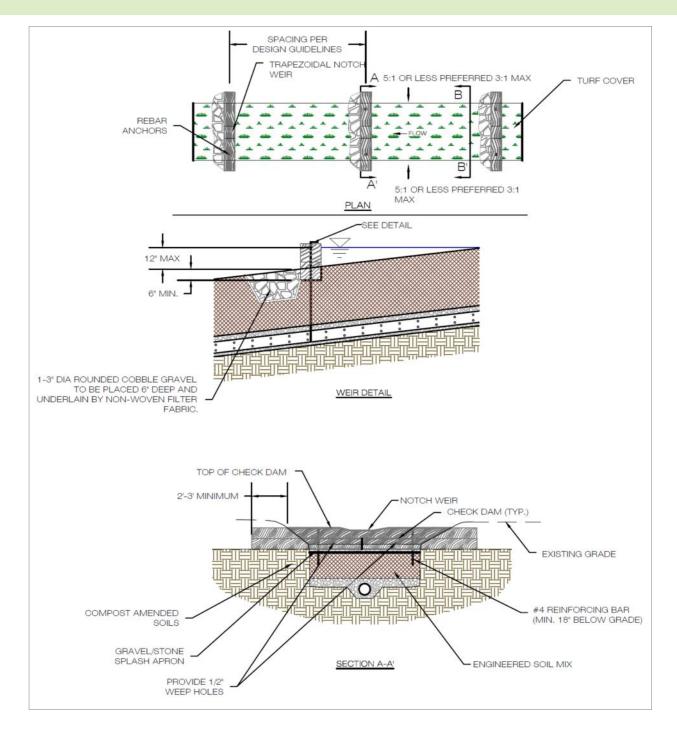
Typical Detail for Water Quality Swale Check Dam (source: VADCR, 2011; MWS edited 2020)
